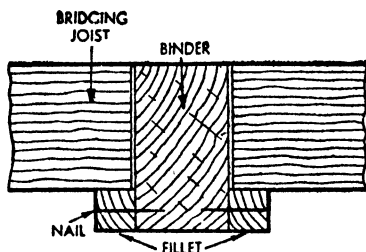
Bridging joist resting on fillet nailed along the bottom edge of a wooden binder. This is a bad form of construction as the nails through the fillet actually support the joists.
